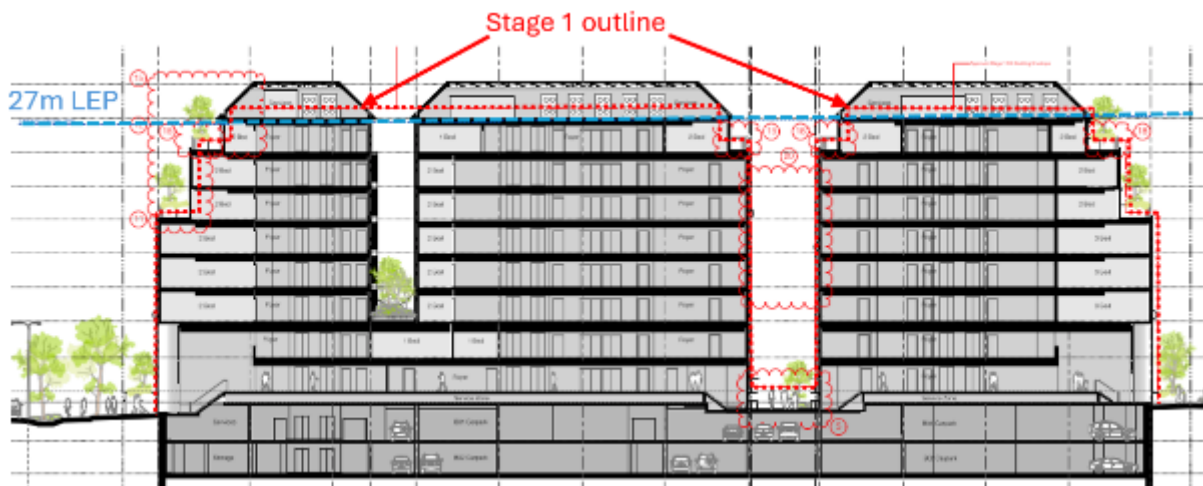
Proposed residential flat buildings height non-compliance depicted above the maximum permitted height plane of 27m outlined in blue. Approved concept envelope (D/2015/966/C) outlined in red.
